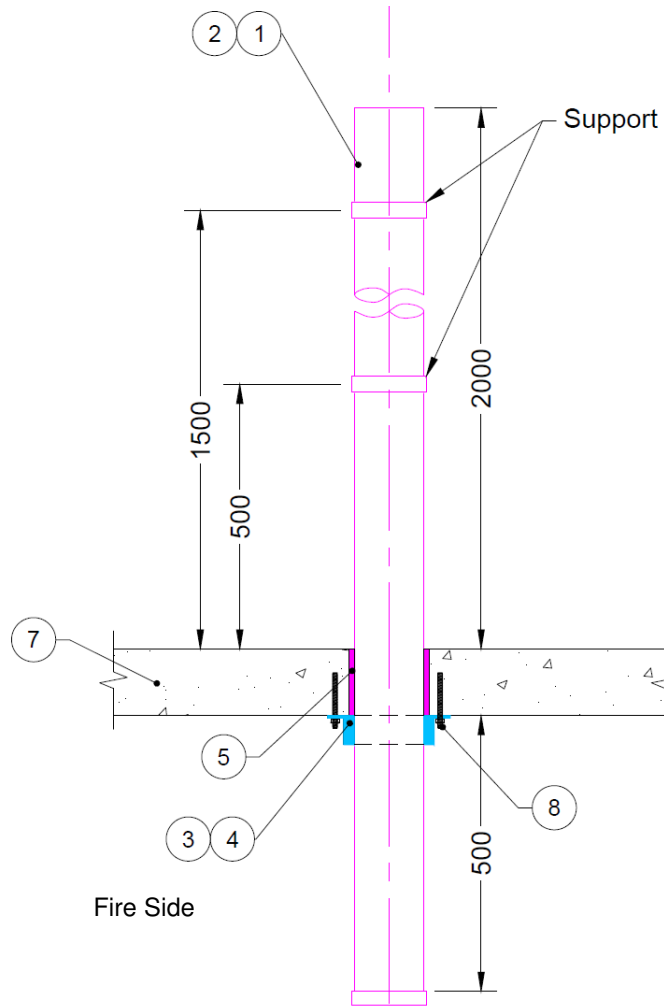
Plastic Pipe with PROMASEAL® FC 40 – 150 Collars (Floor Underside Plan View)
